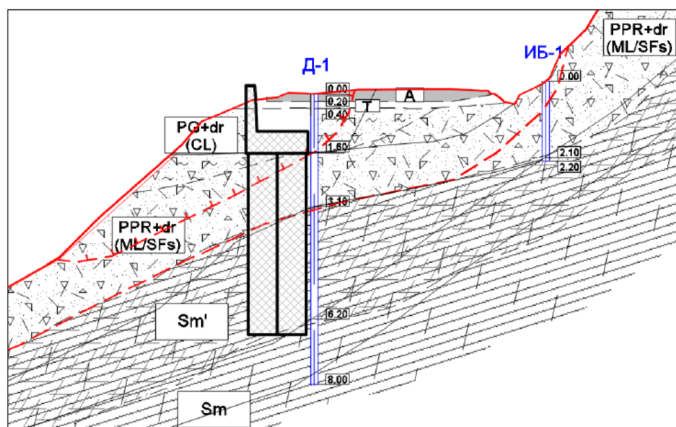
Typical section for repair solution of landslide on regional road to village Konce with retaining wall founded on piles
